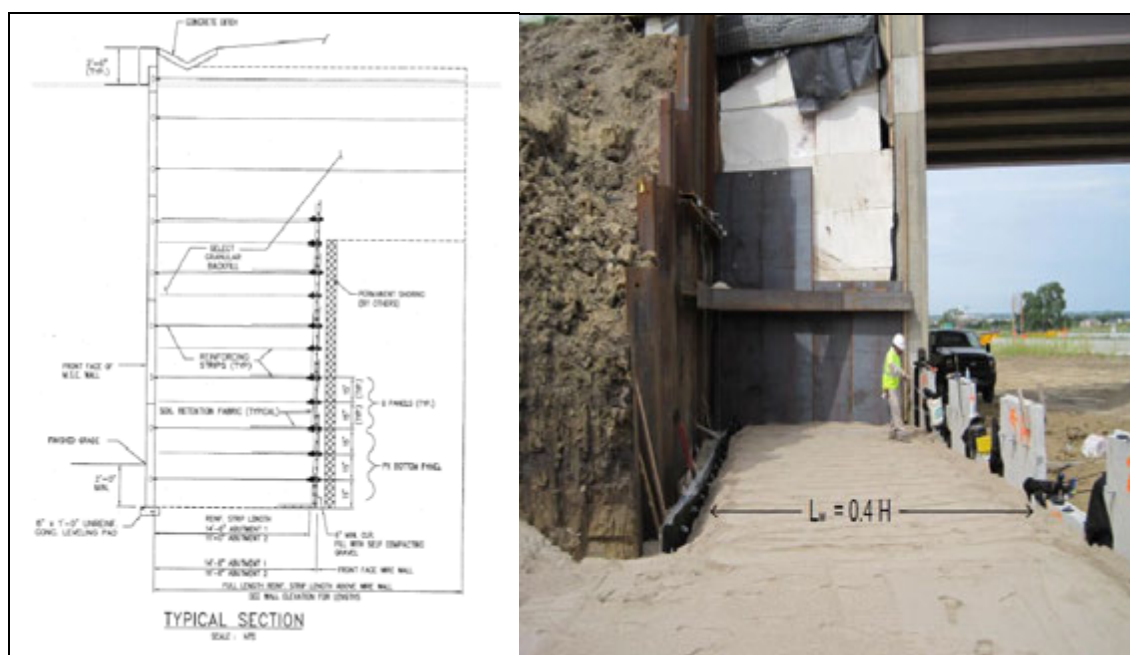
148th Street, Nebraska (a) typical section and (b) during construction
